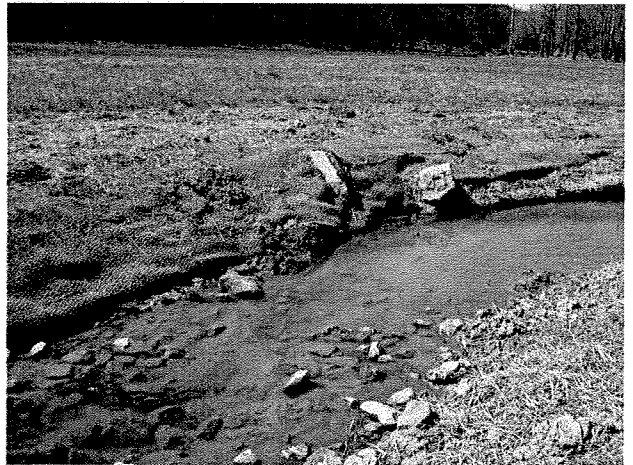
Looking downstream from rock J vane installed at LT Station 8+38. (9/27/04)
